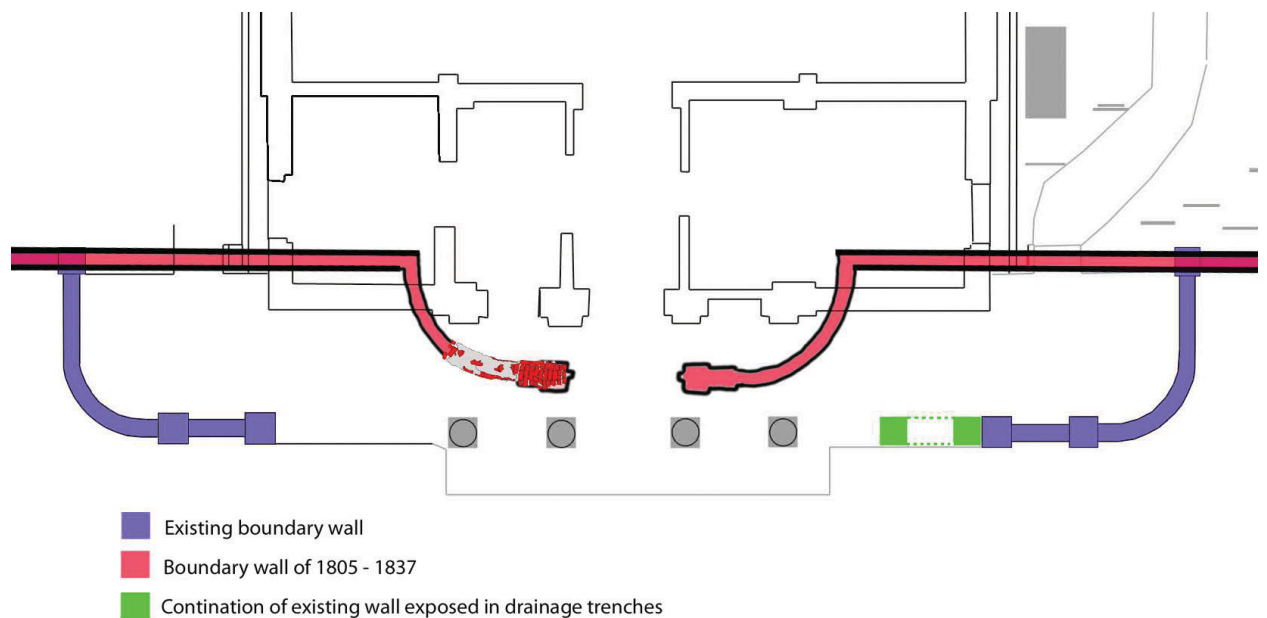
Plan of western face of church showing the location of the existing boundary wall and the earlier wall c1805 based on contemporary plans. Inset with locations of wall foundations exposed during the watching brief.
